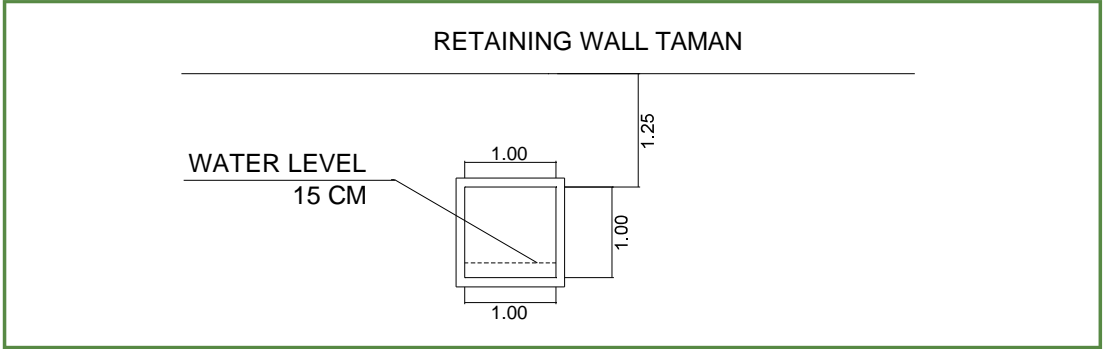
DETAIL OF BOX CULVERT - 2 (TAMBORA AREA-3)
